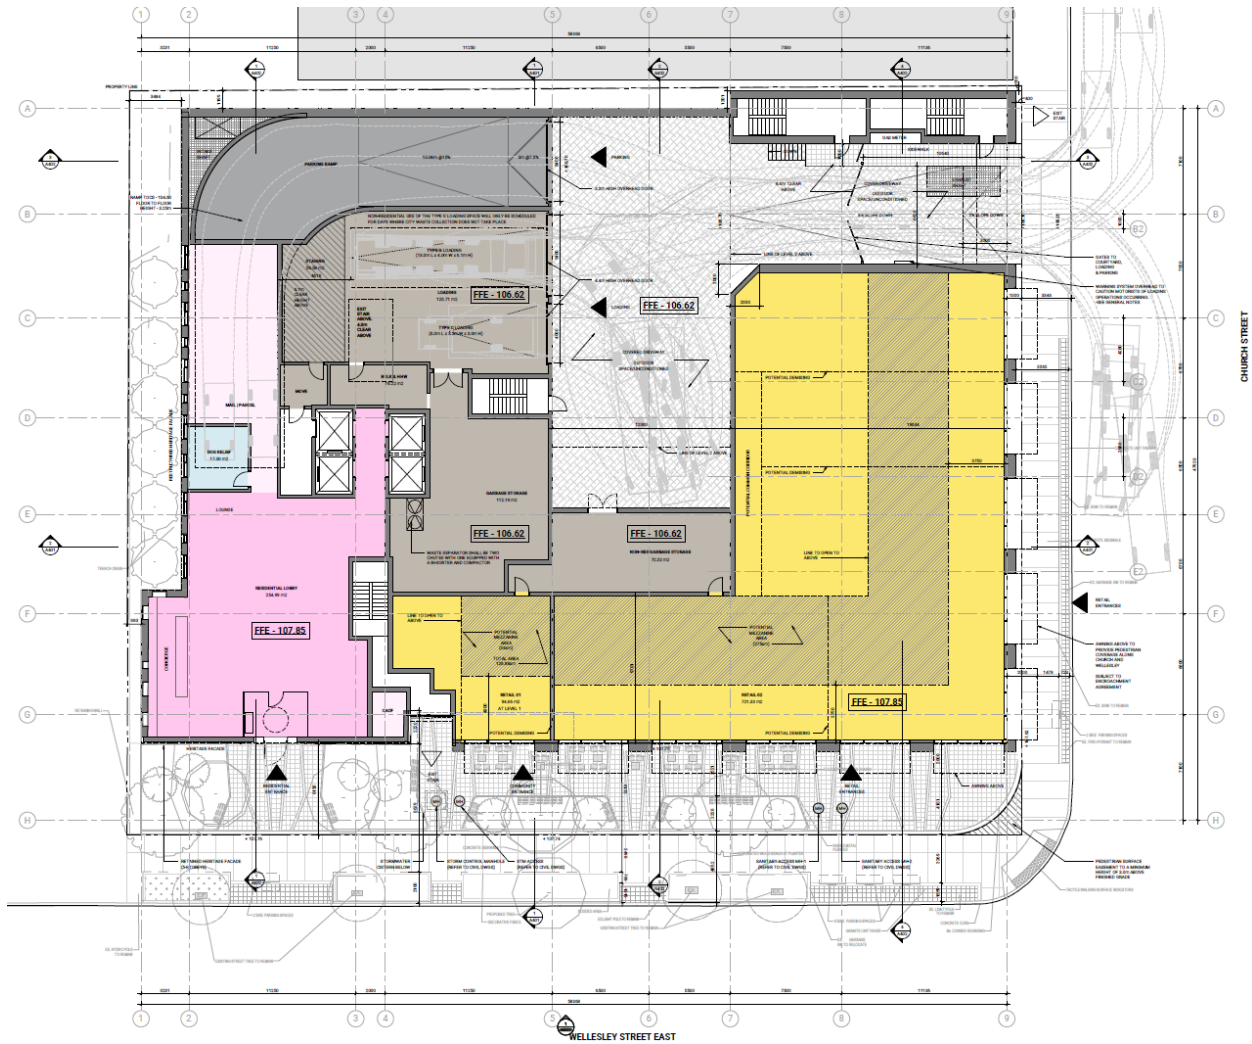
Ground floor/site plan for 64 Wellesley Street East included for illustration purposes (ERA Architects Inc., March 3, 2026).
